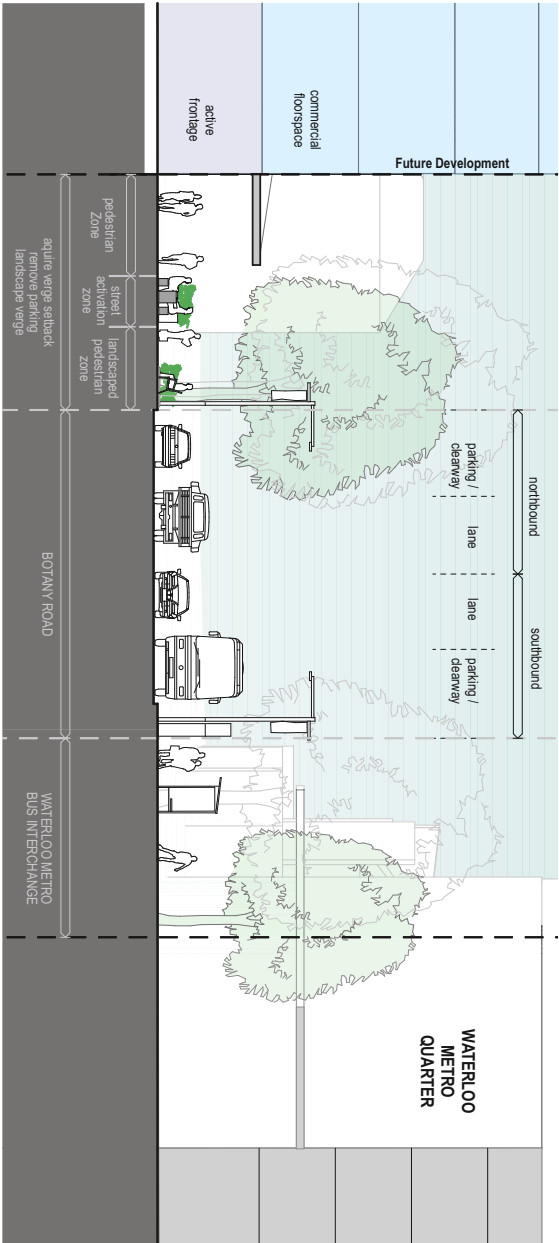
Street Typology Section A - Waterloo Metro Quarter
